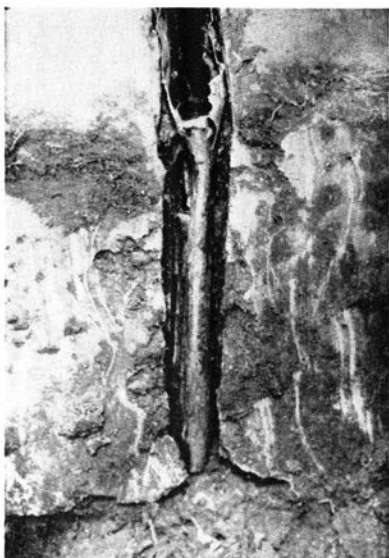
(ABOVE, AT LEFT). TYPICAL EXAMPLE OF FRACTURED END SEAL ON J-1 EXPANSION JOINT
